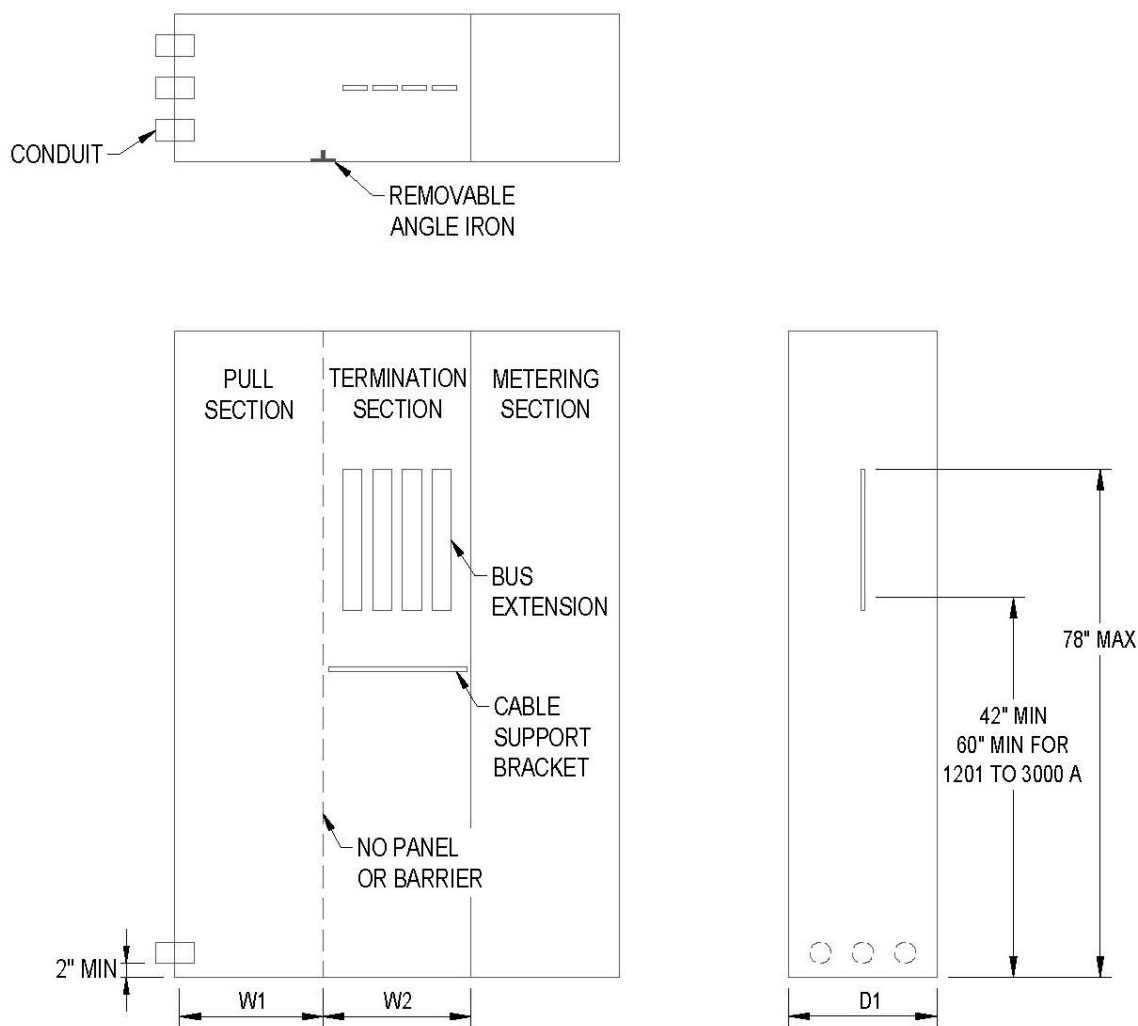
Underground Service Termination in a Pull Section Below Ground Level, Showing Pull Section with Side-Entry Conduits at the Bottom (STD-D-6264)
